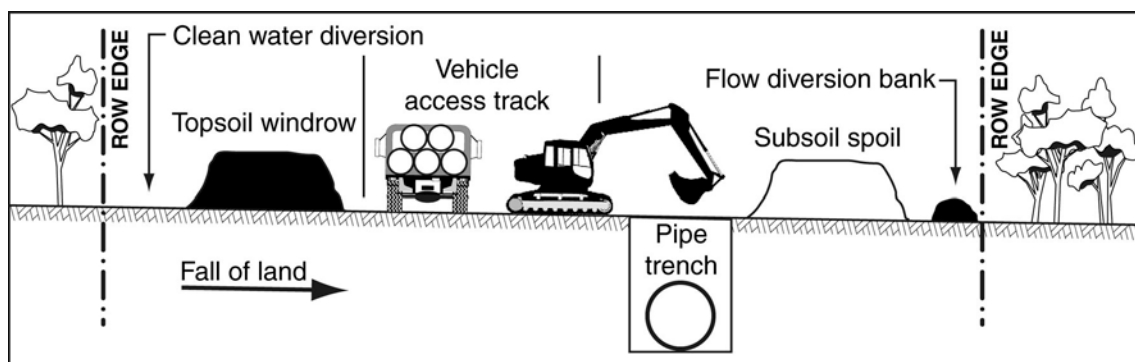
Typical RoW with trench down-slope of the vehicle access track
